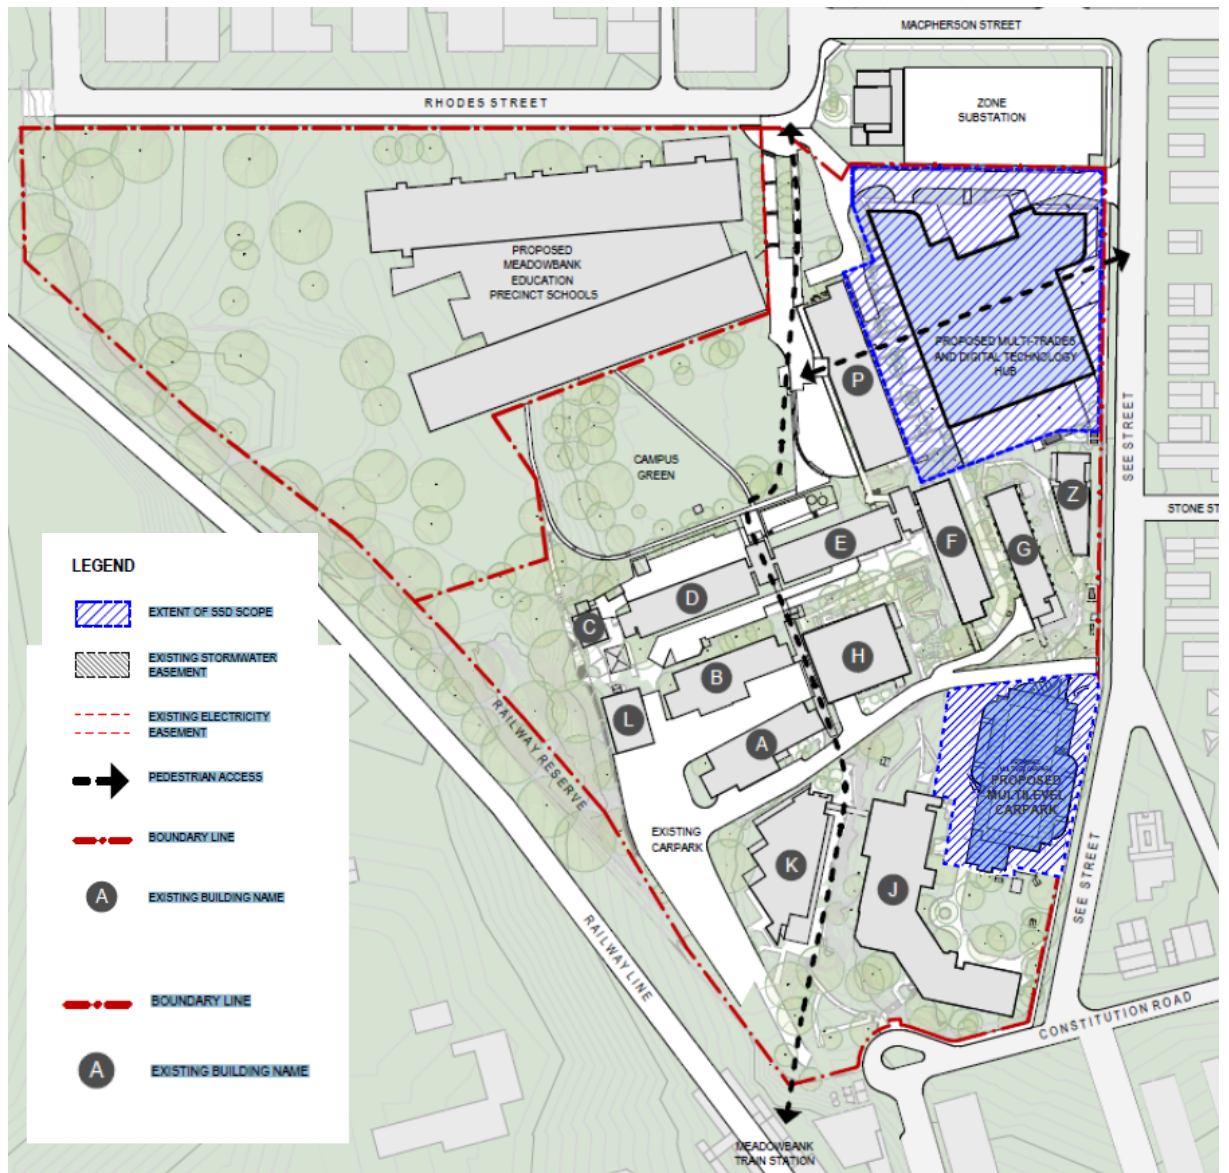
Plan of the new Meadowbank Education Precinct site, including TAFE Meadowbank proposed works (Source from GP Architecture Drawings – April 2020)
